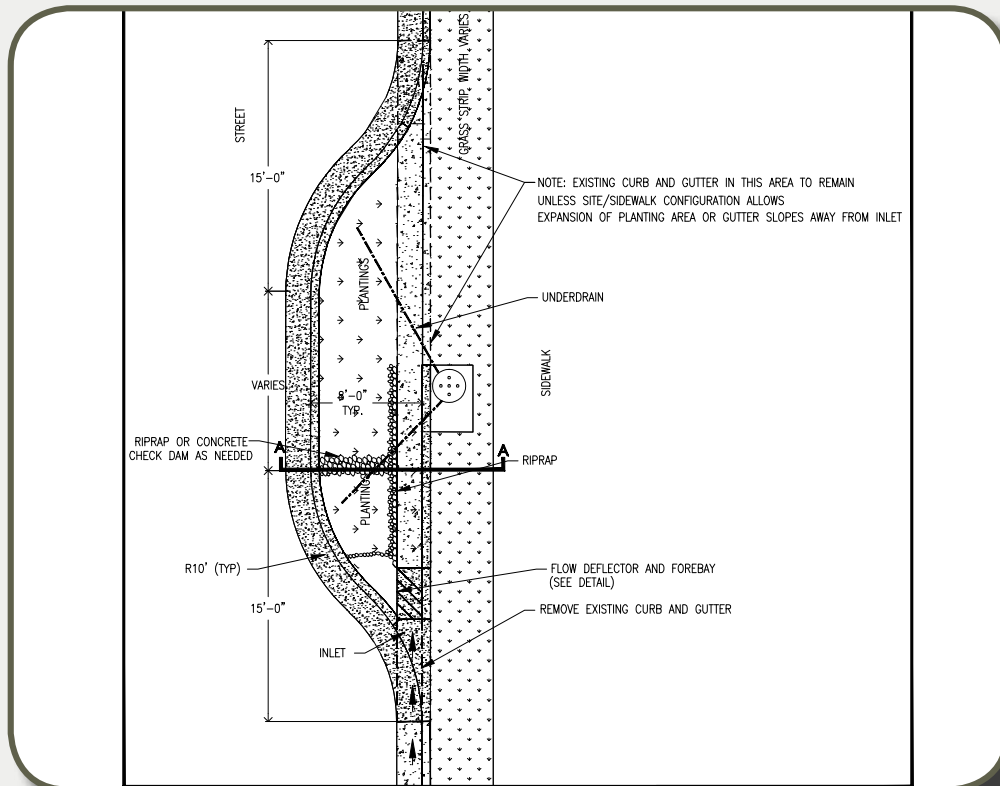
Typical plan view for stormwater curb extension tied to existing inlet structure. See Figure UB-4 for detail of cross-section A-A.
